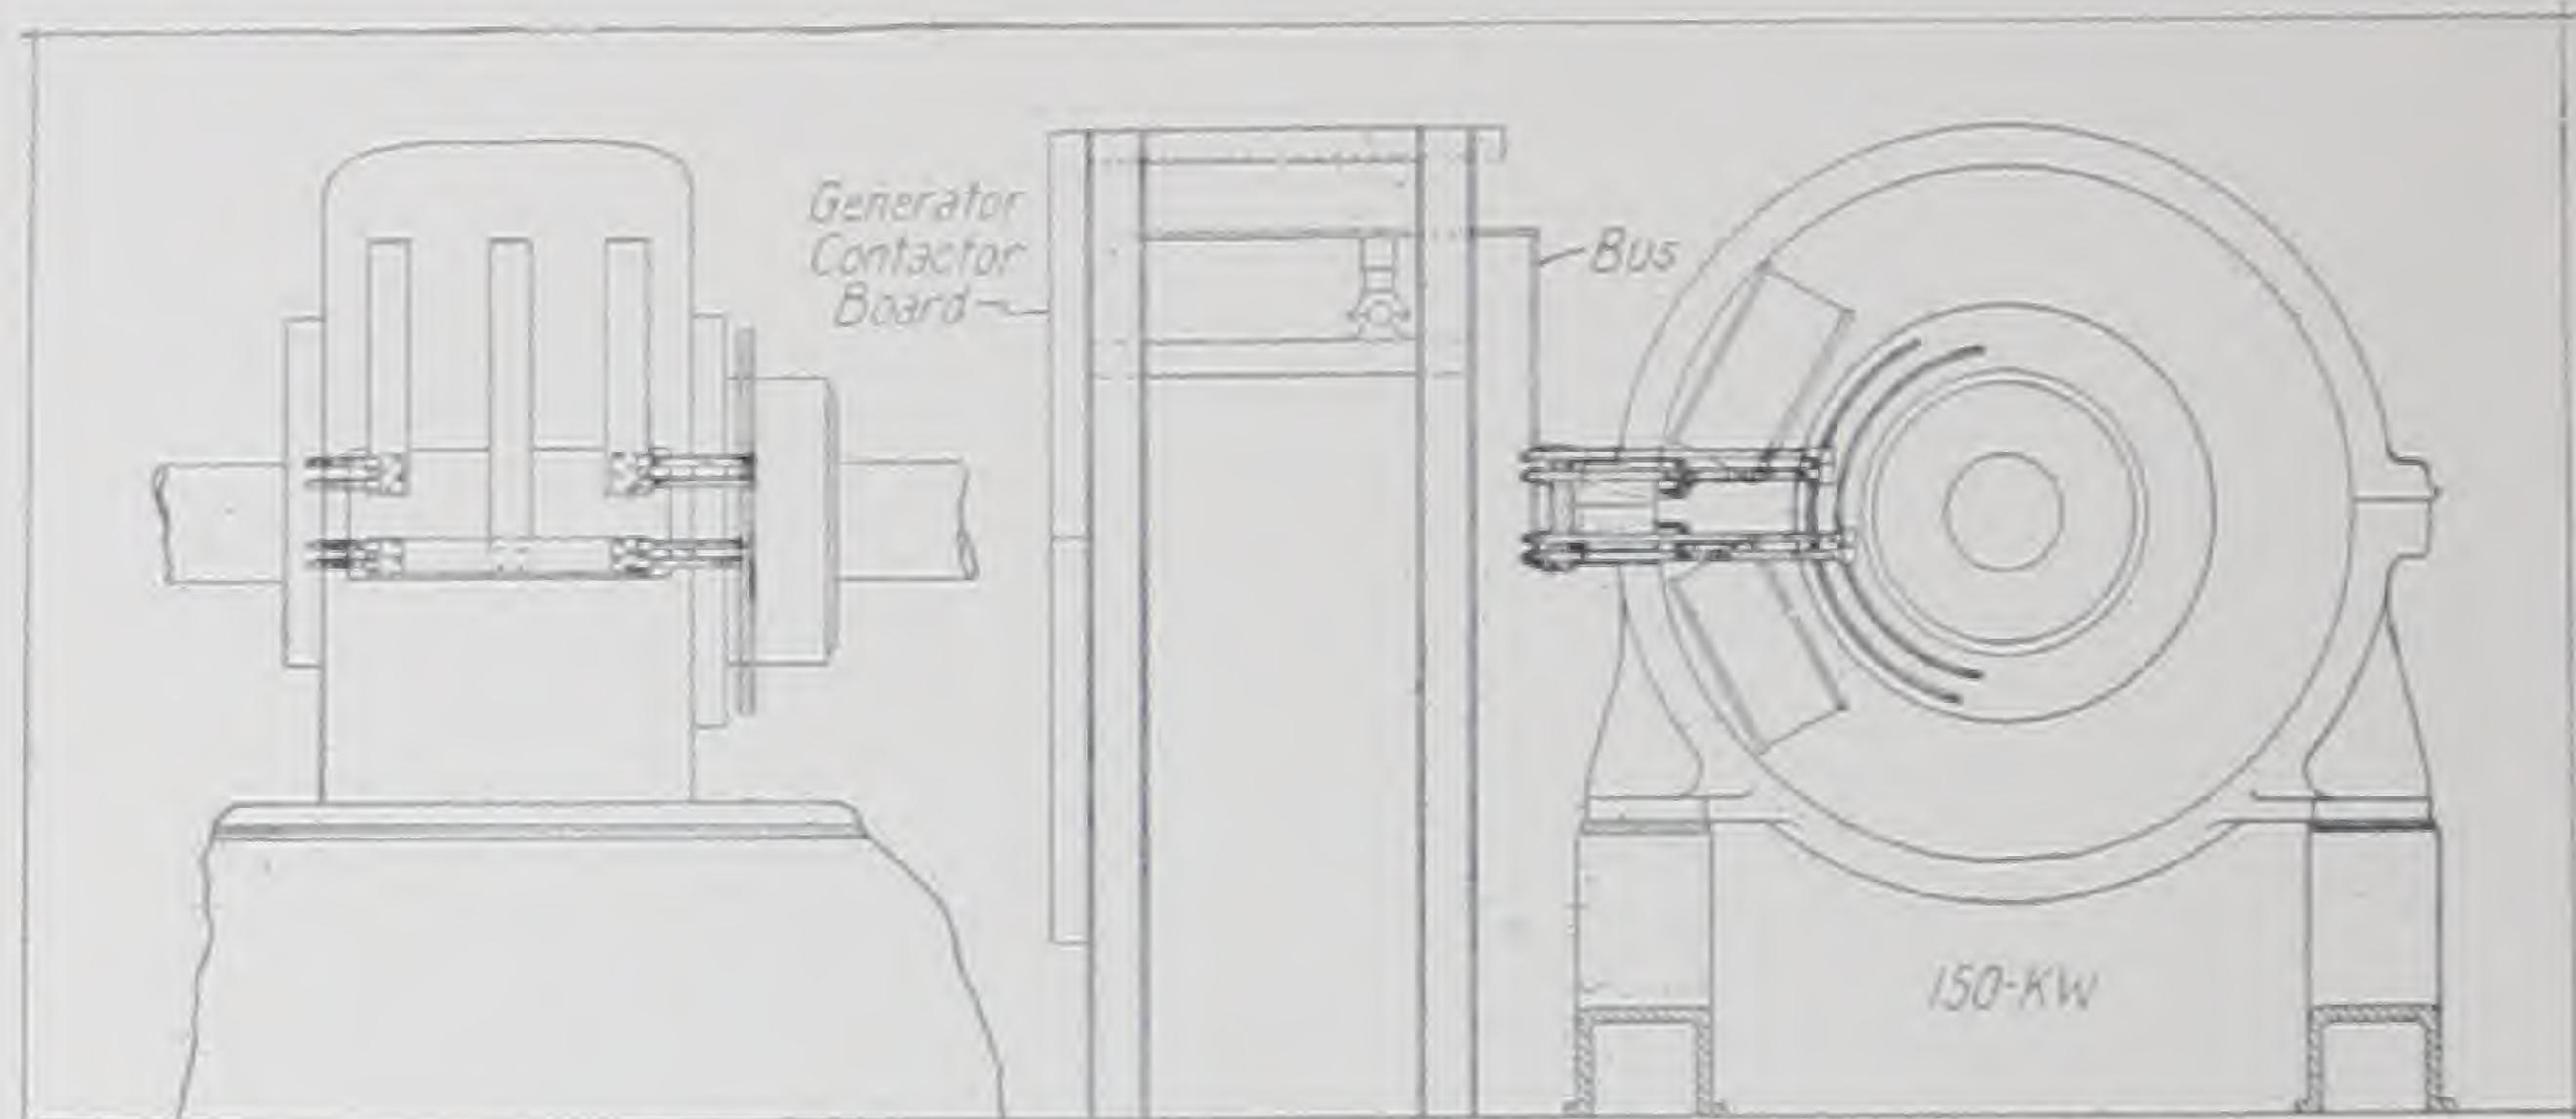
Detail of Arrangement of Generator in Old Engine Room.
